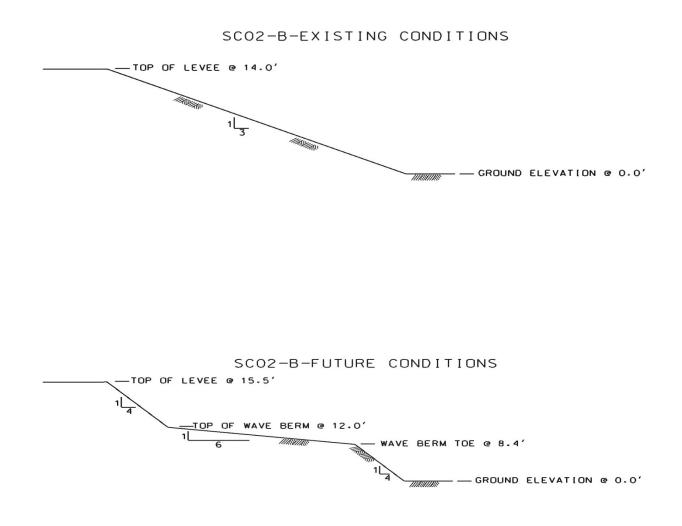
Typical Levee Design Cross-sections St. Charles Parish Levee East (SC02-B)
